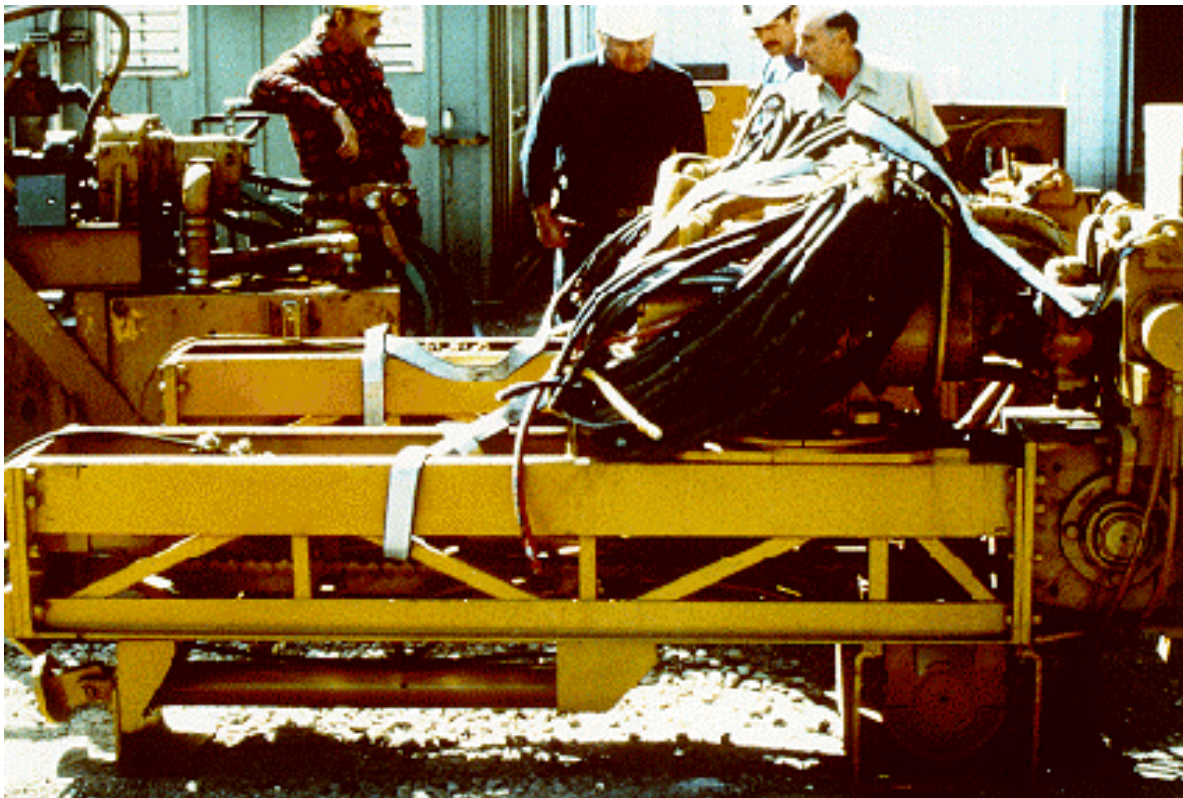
Small Frame-Mounted Rotary Hydraulic Drill Rig.
